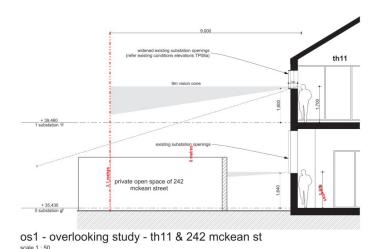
modified overlooking section from Townhouse 11 showing impact of removal of window shroud.
